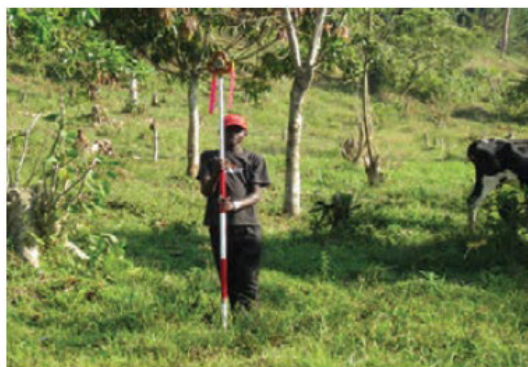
Holding the Ranging Rod at Instructed Location
